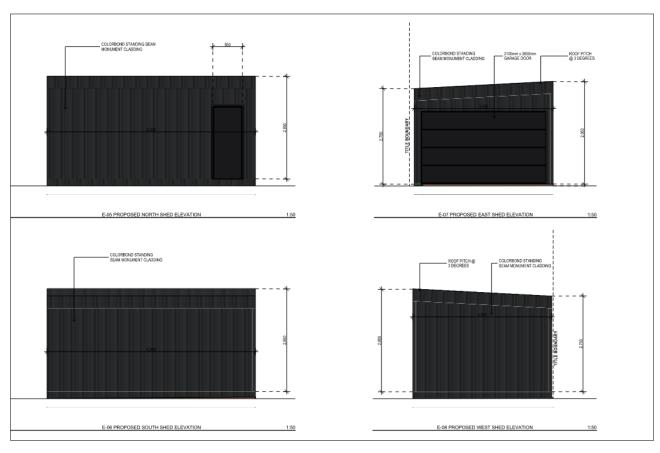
Outbuilding elevations (Cykel Architecture, 2023)
